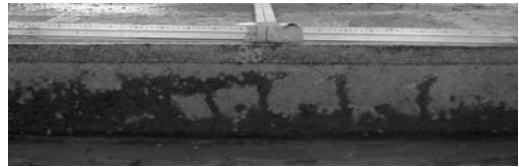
Post mortem longitudinal trench face highlighting transverse fatigue cracking resulting from ALF trafficking.
